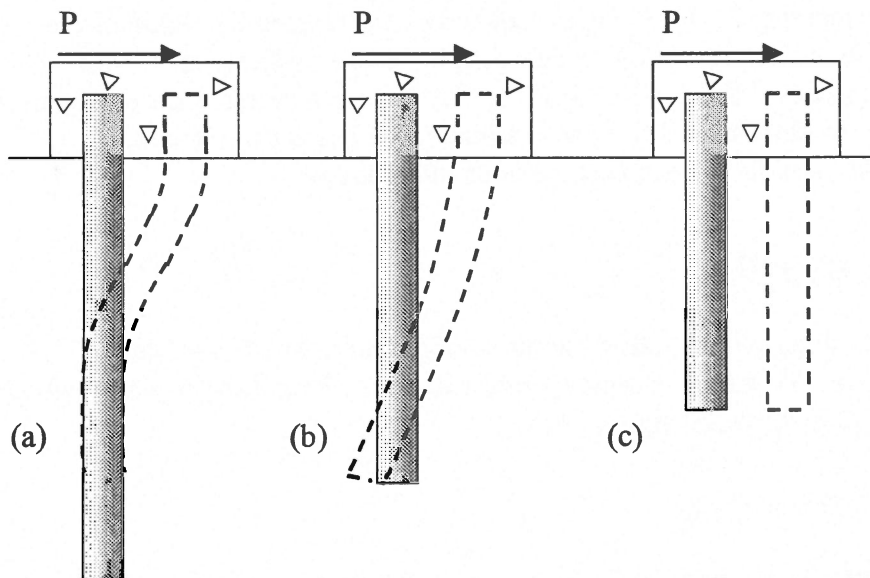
Failure Modes for Fixed Laterally Loaded Piles: (a) Flexible; (b) Intermediate; (c) Rigid (After Broms, 1965)
